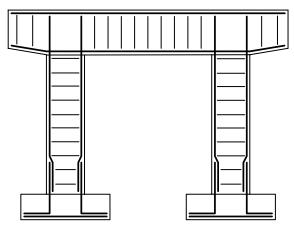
Secondary Reinforcing Steel in Column Bent with Web
